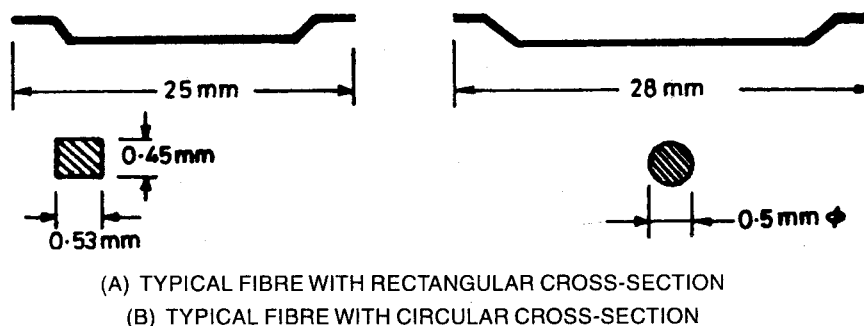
TYPICAL FIBRES USED IN SHOTCRETE WORK
